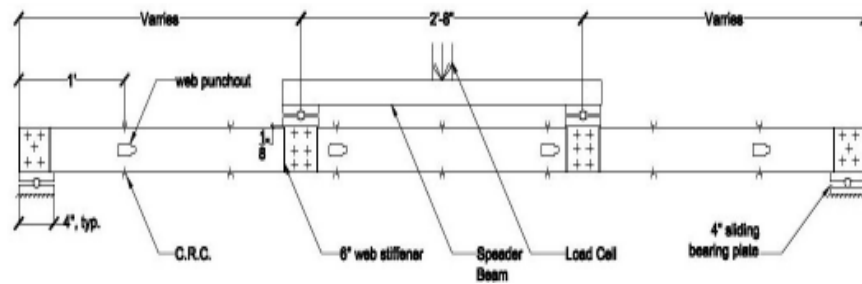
Test specimen (3.625-in (92 mm)) showing extended web stiffeners.
